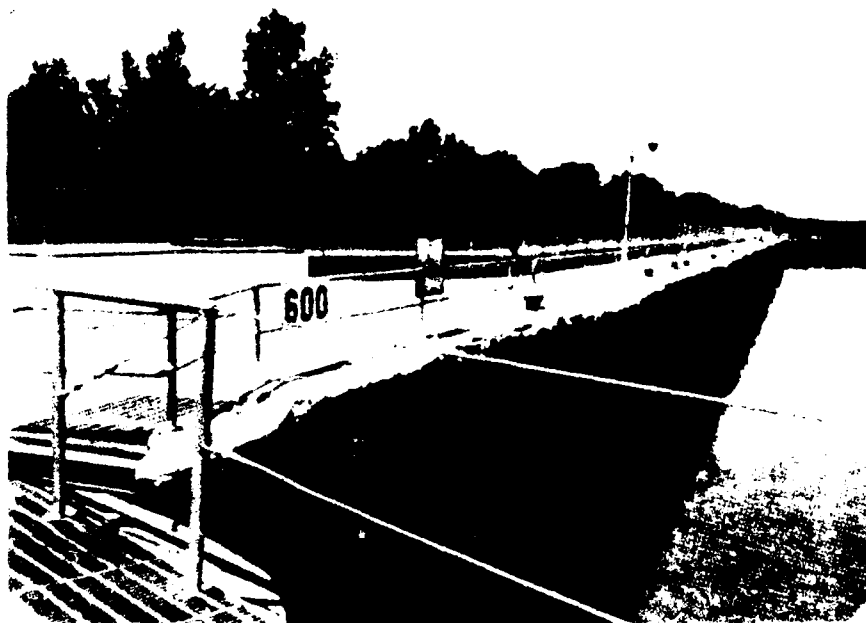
Typical concrete deterioration, 1962, Marseilles Lock
